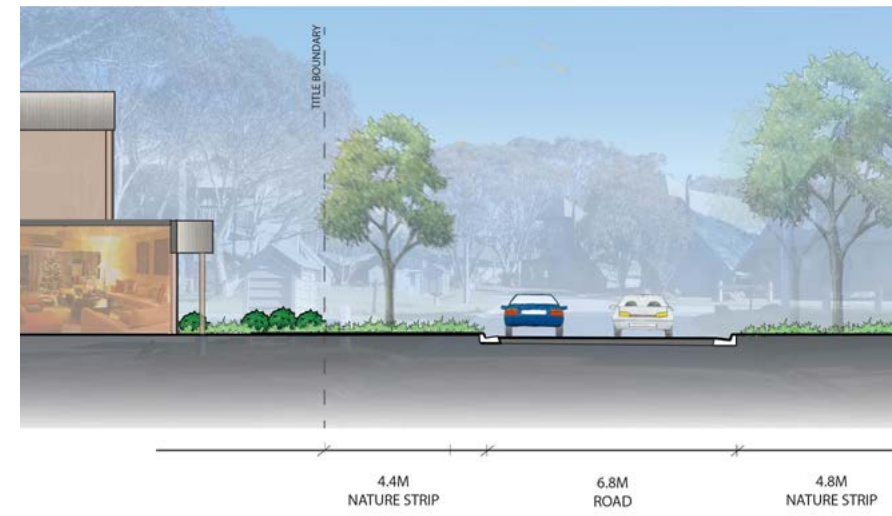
Existing Big Muster Drive - Residential Precinct - Tower Road to Scrubbers End
